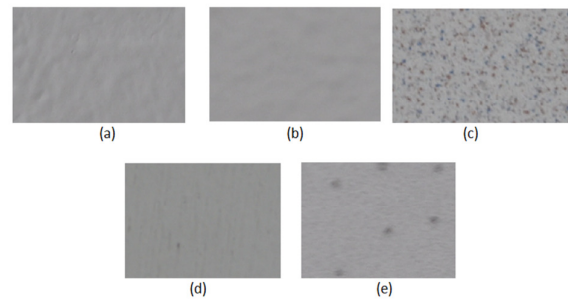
Sample images of (a) concrete wall, (b) wooden wall, (c) floor, (d) door, and (e) ceiling surface
